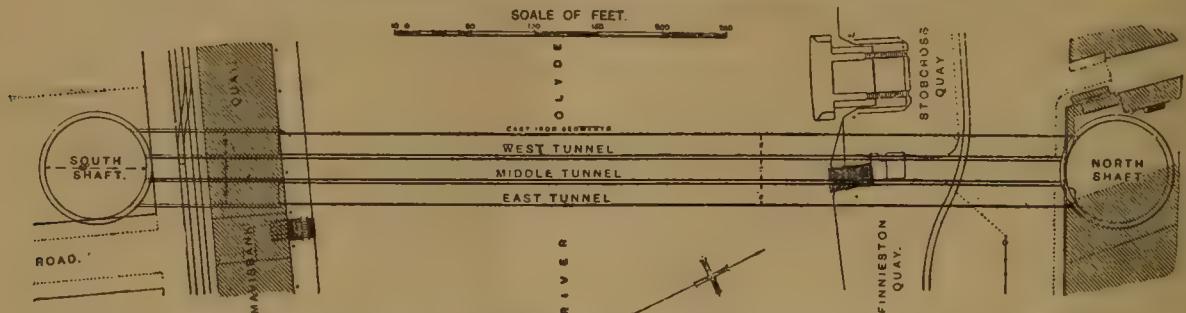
PART SECTIONAL PLAN OF TUNNELS AND SHAFTS.
